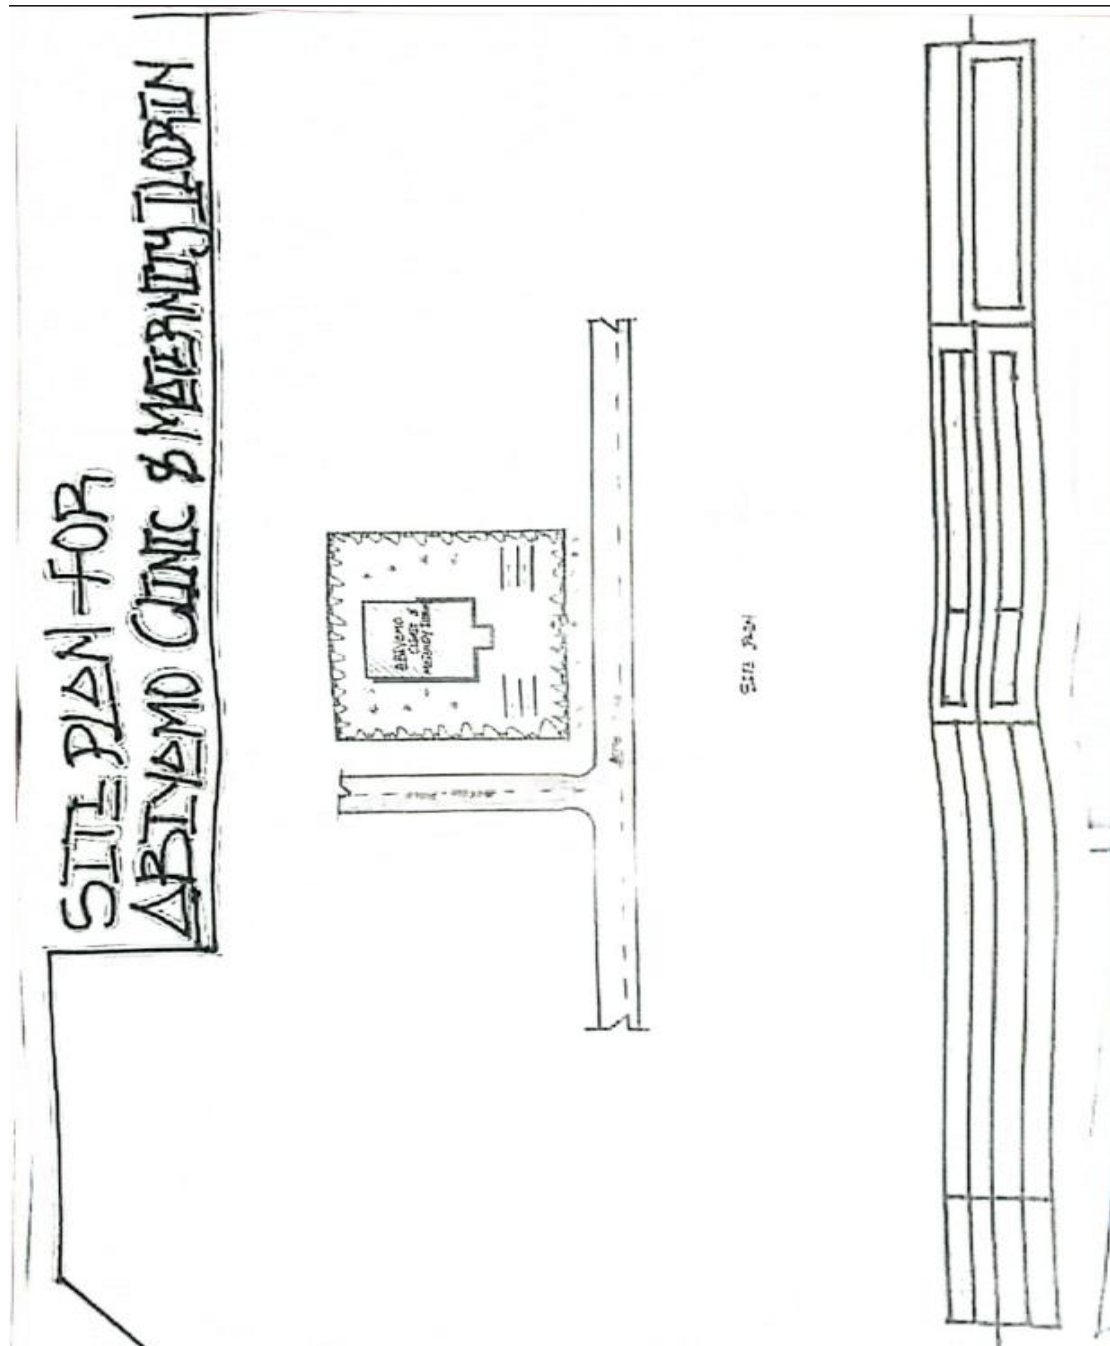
SITE PLAN OF CASE STUDY 2
